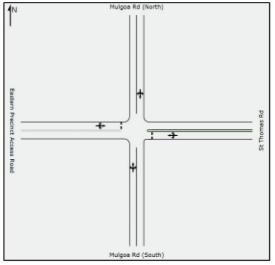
shows existing configuration of Mulgoa Road/St Thomas Road intersection and Figure 4.7 presents the proposed intersection layout with the Proposed Eastern Precinct Access Road at the intersection. The intersection layout under this assessment includes a Basic right turn (BAR) treatment for Mulgoa Road approaches, which result in maximum delay to traffic or a worst case scenario from an operation point of view.
